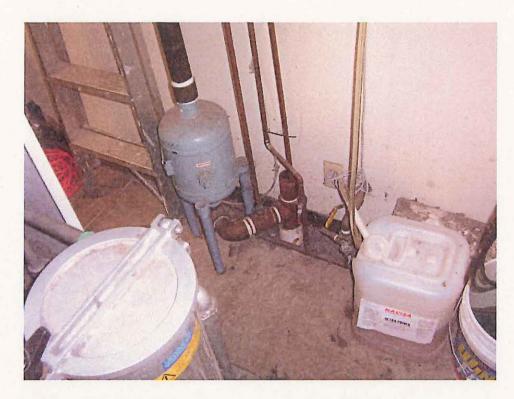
Photo of the floor drain located near the dry cleaning machine; photo taken on February 23, 2006.
